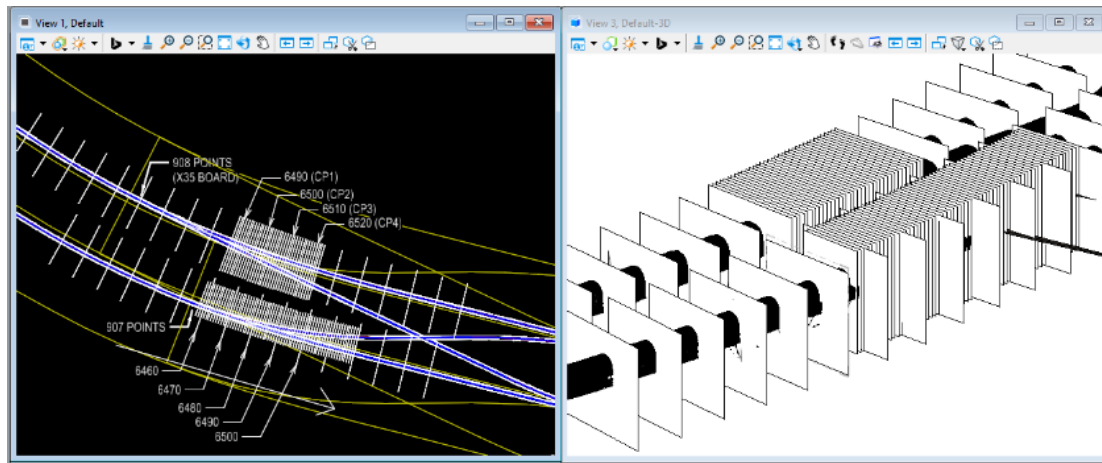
Bentley OpenRail software showing tunnel cross-sections, track alignments, and kinematic envelopes used for instrumentation planning.
